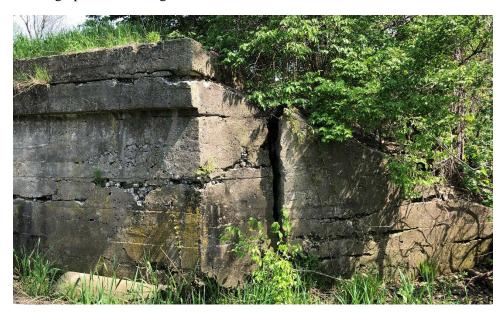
Drainage Pipe Running Through Northwestern Abutment
